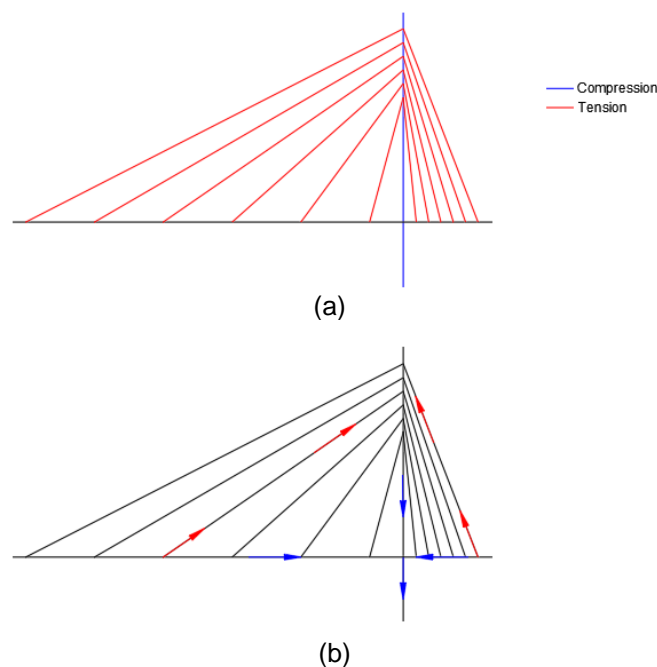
(a) Stresses diagram of Cable-stayed Swing bridge (b) Load Paths of Cable-stayed Swing Bridge (not at scale)
